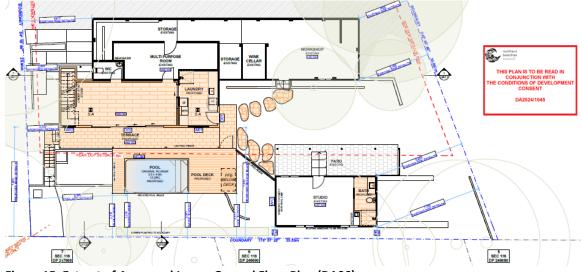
Extract of Approved Lower Ground Floor Plan (DA06)
